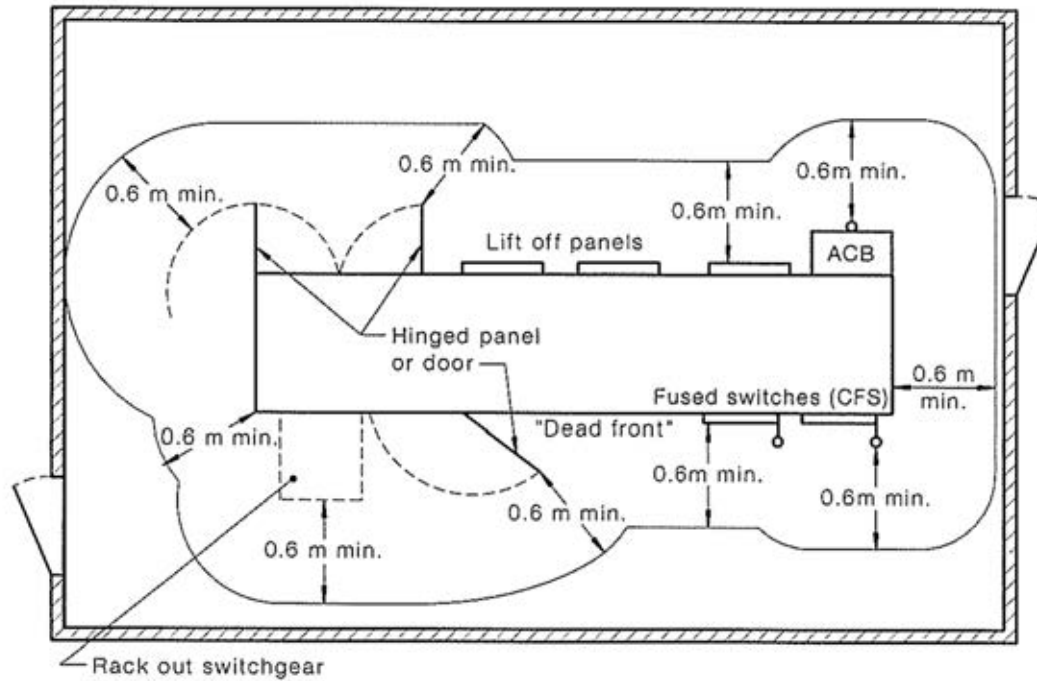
ACCESS TO SWITCHBOARDS—FREESTANDING SWITCHBOARD WITH RACK-OUT SWITCHGEAR
